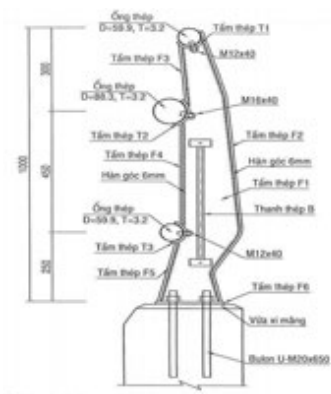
Structure of the bridge handrail for CL-CB sluice gates
